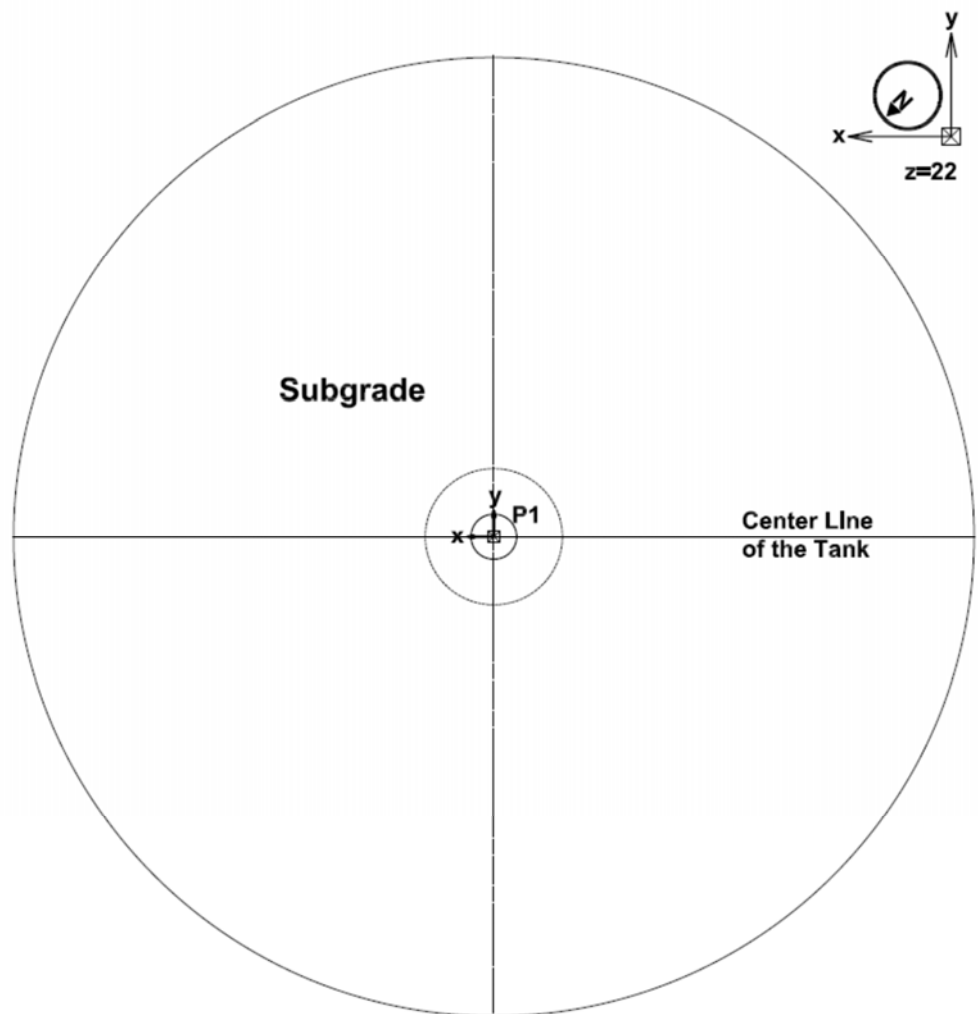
Instrumentation plan for experiment No. 4—Profile view at $Z = 22$ inches
